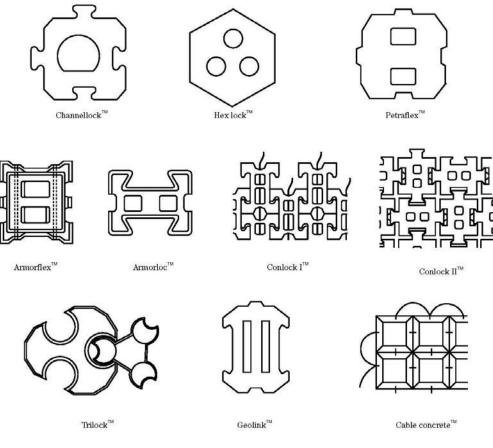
Common examples of precast concrete revetment systems. (NRCS, 2007).
